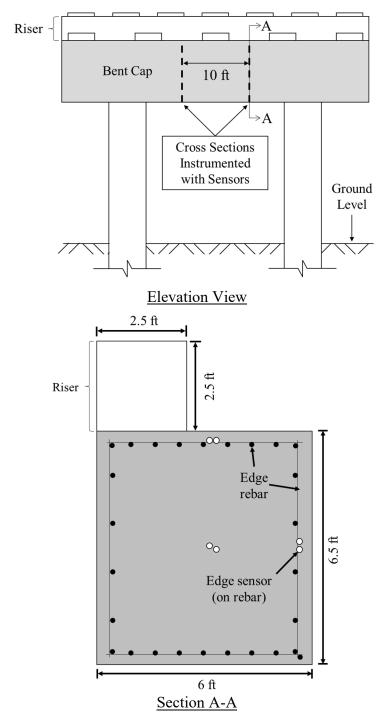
Brewton bent cap instrumented cross-section locations (top) and temperature sensor locations on these cross sections (bottom)
